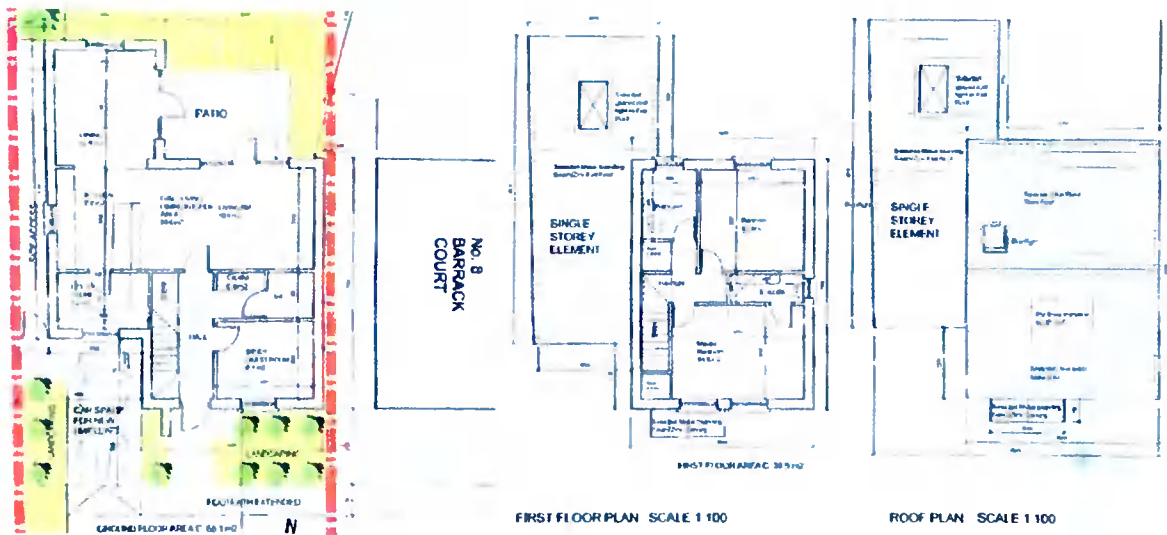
Floor plans refused under Reg. Ref. SD19A/0128 and ABP Ref. 307316-20.
